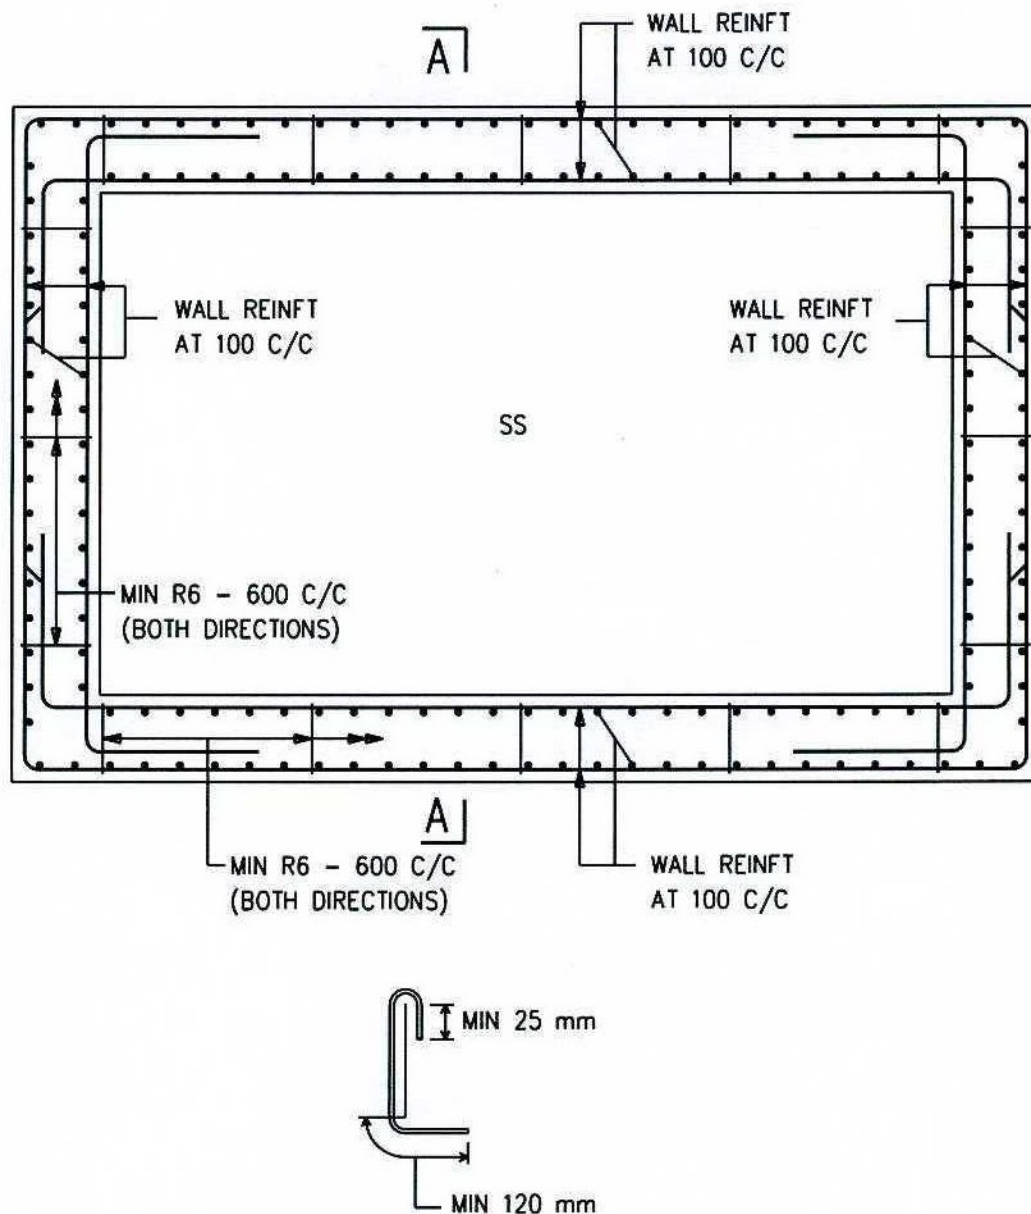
PLAN OF NS WALL & COLUMNS
